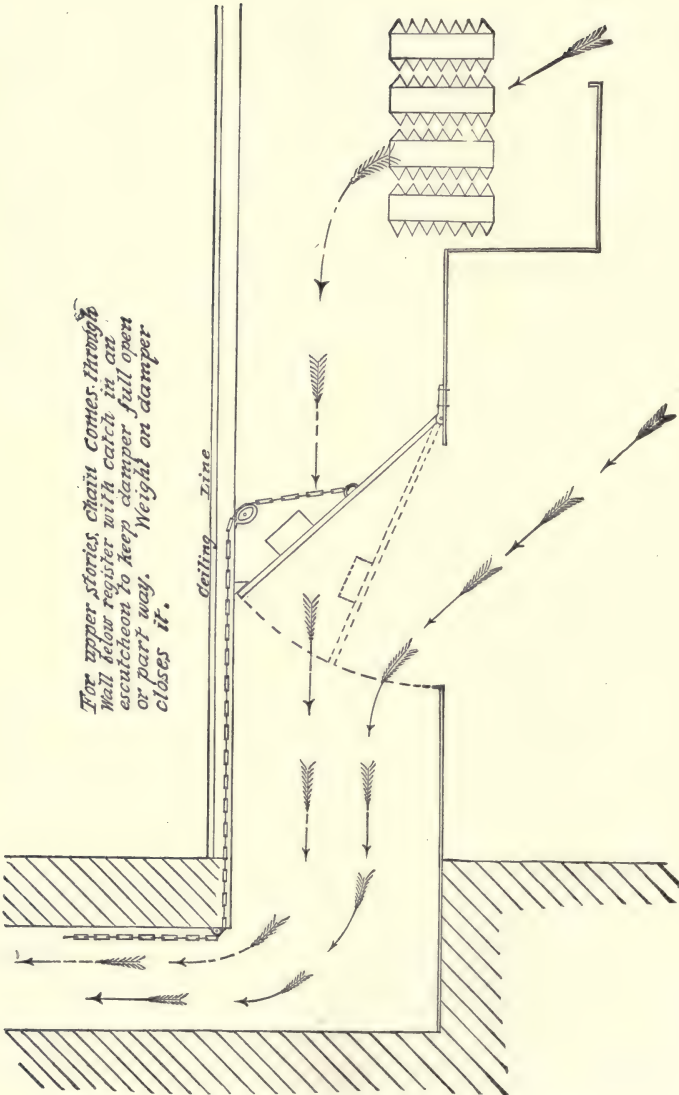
SWITCH VALVE FOR HEATING COILS.
